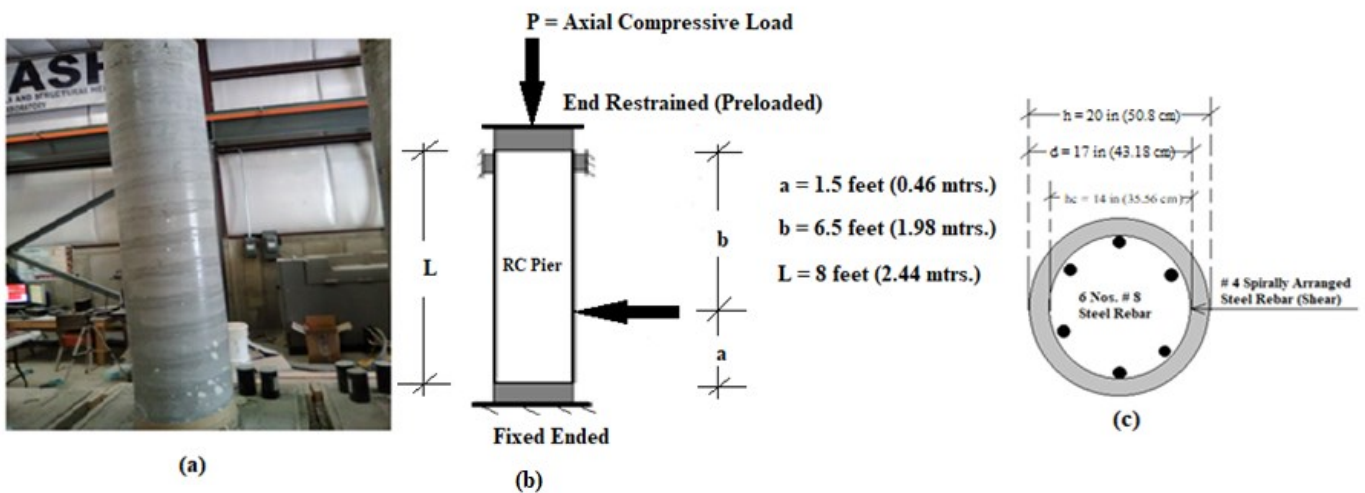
(a) RC pier specimen; (b) load and end conditions; (c) pier cross-section.
